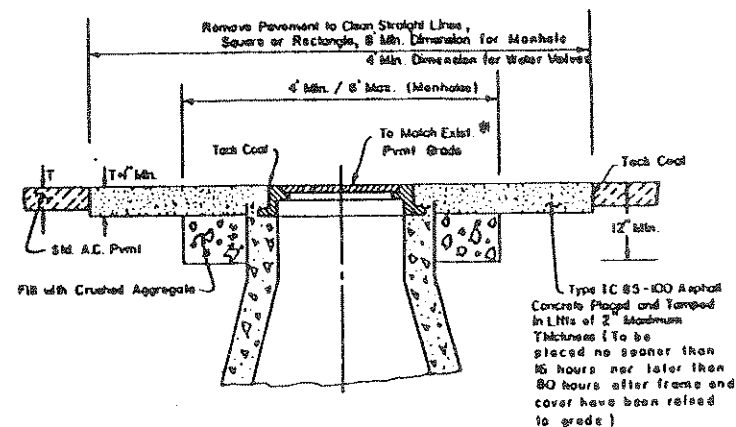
DETAIL FOR TRENCHING, BACKFILL & A.C. PAVEMENT REPAIR
